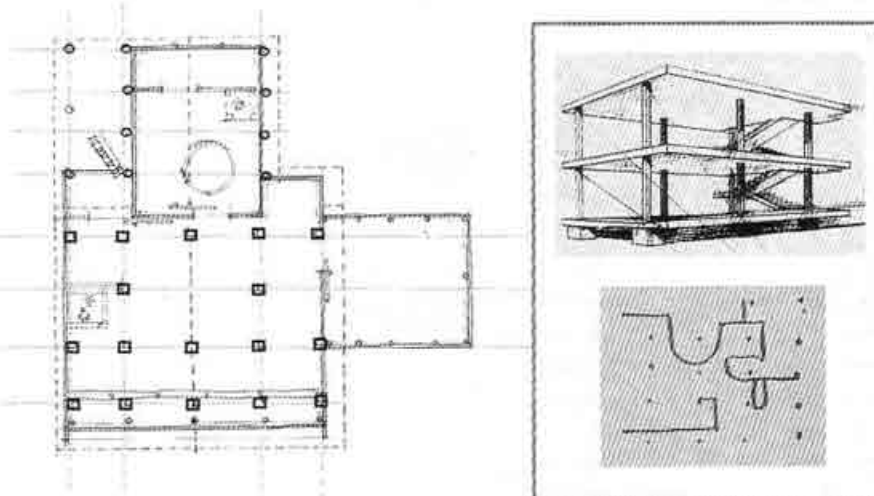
Modernist space – a flexible plan with freestanding pillars and movable walls.
